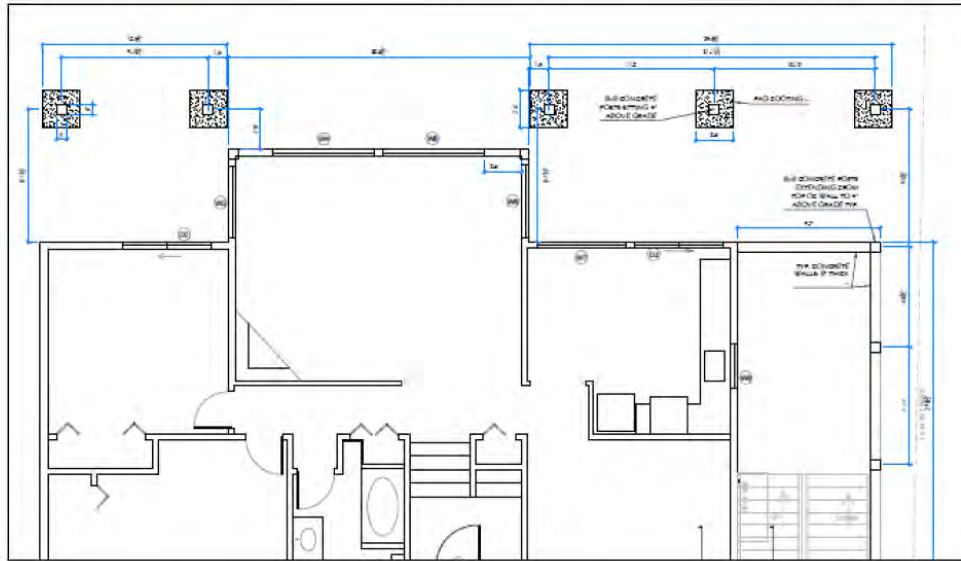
Aerial view of the proposed locations of concrete footings (north) and concrete wall (east) for the foundation. Drawings provided by Momentum Design Build.
